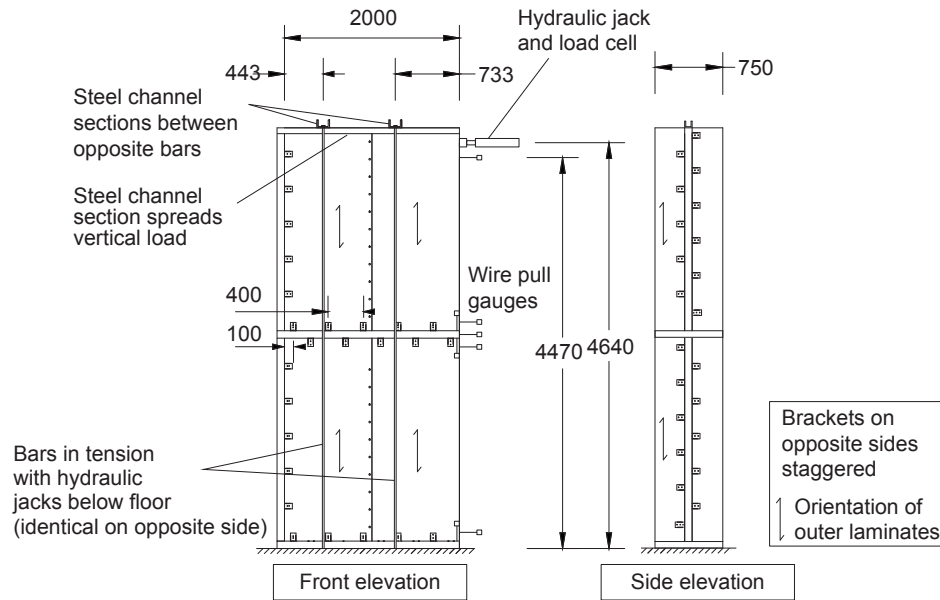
Test setup and dimensions for shear-wall tests - the specimen with half lap joint is shown (dimensions in mm)
